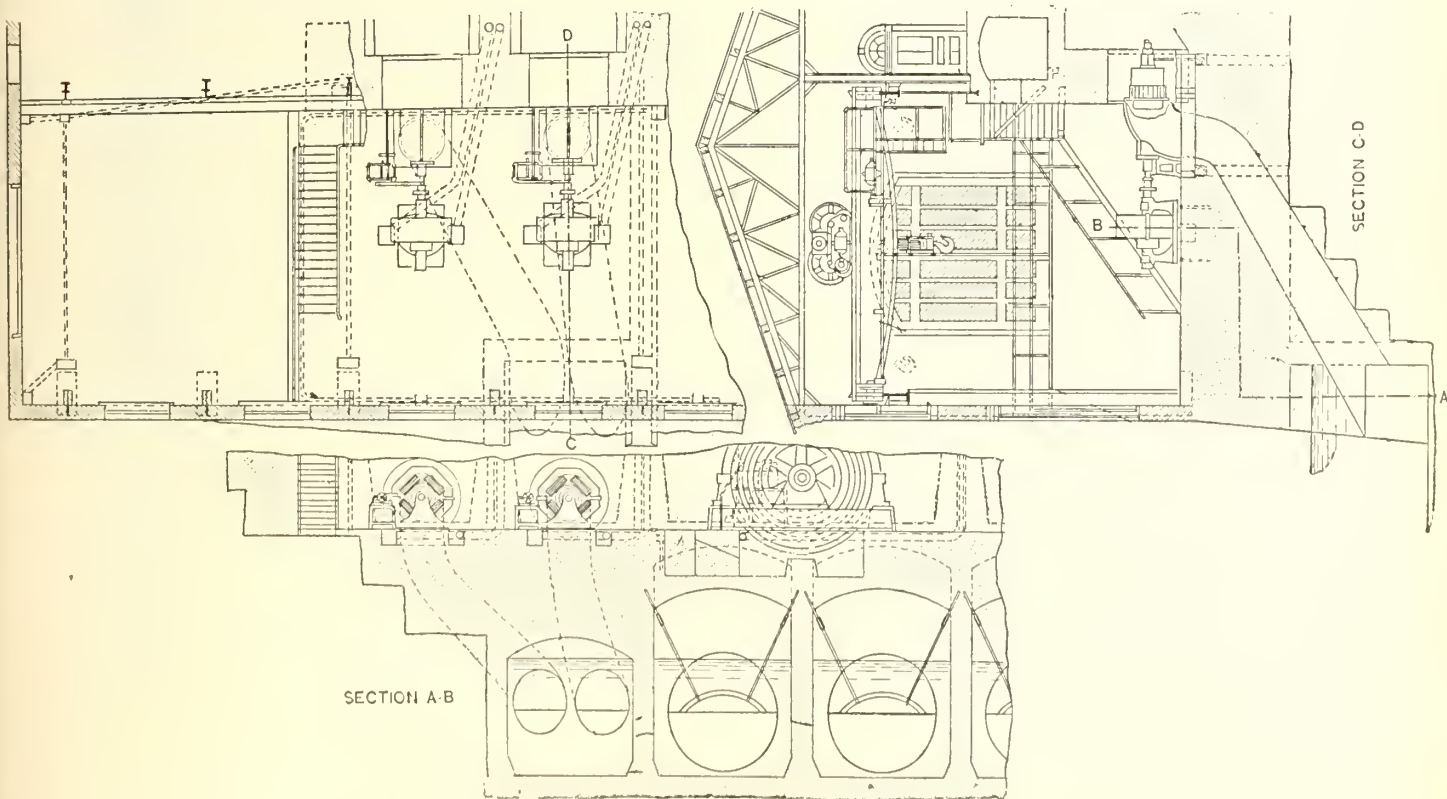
SECTIONAL ELEVATIONS THROUGH EXCITER WHEELS AND POWER HOUSE.
